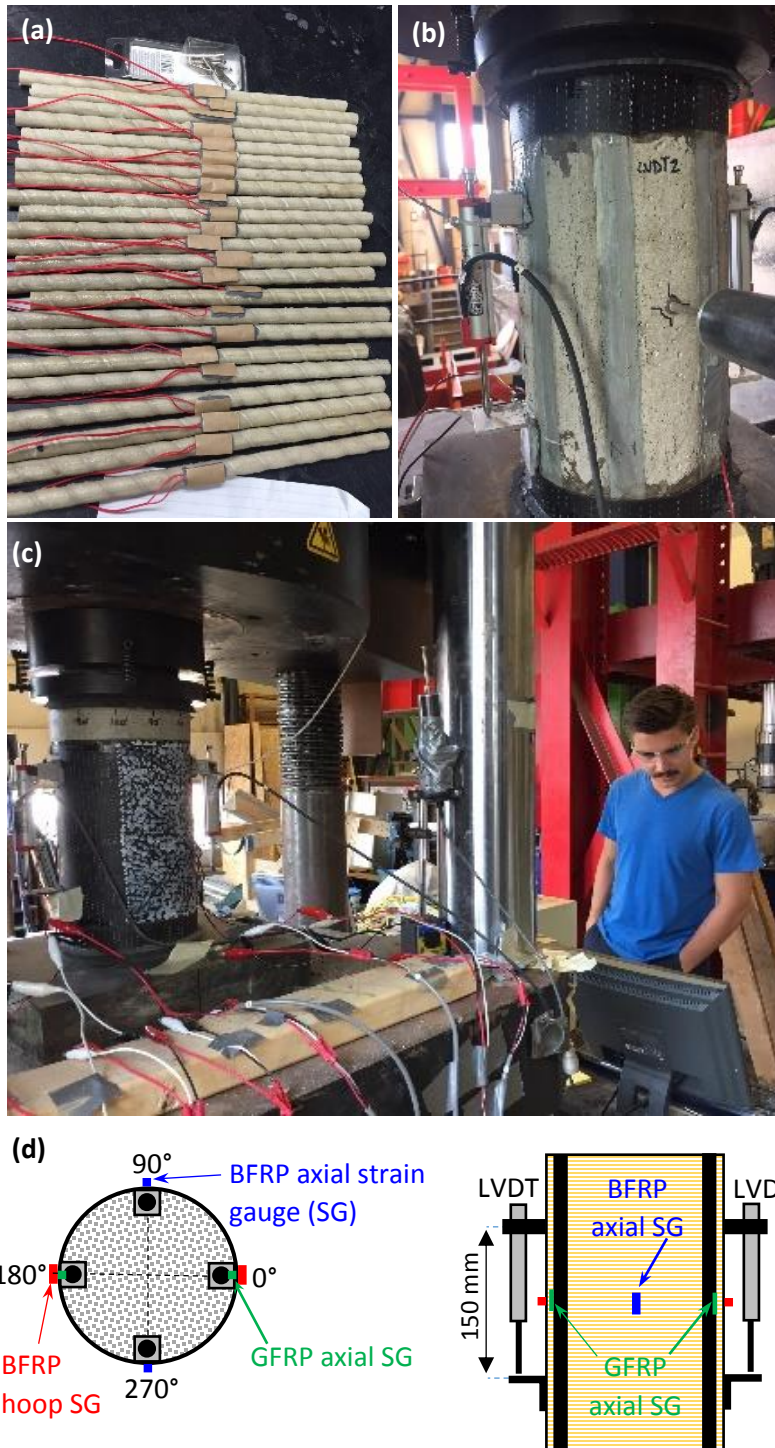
Instrumentation and test setup: (a) GFRP bars strain gauged; (b) LVDT arrangement of NSM specimens; (c) LVDT arrangement and test setup of NSM-wrapped specimens; and (d) schematic instrumentation of NSM-wrapped specimens.
